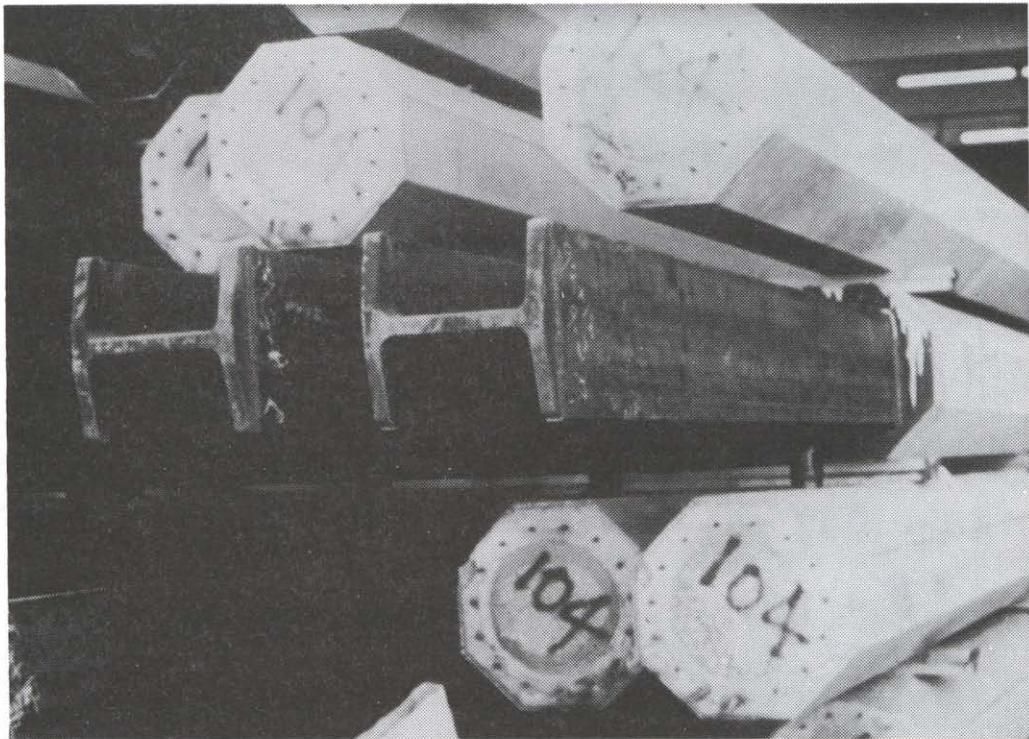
Steel H-pile Tip for Precast Concrete Pile
